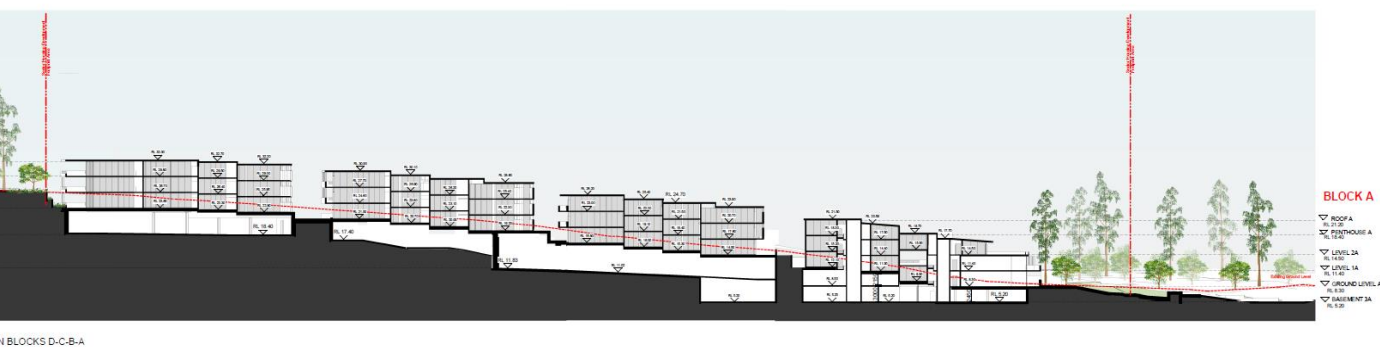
Proposed building arrangement and separation between the blocks (Source: Marchese Partners refer to architectural plans no. 1.03)
